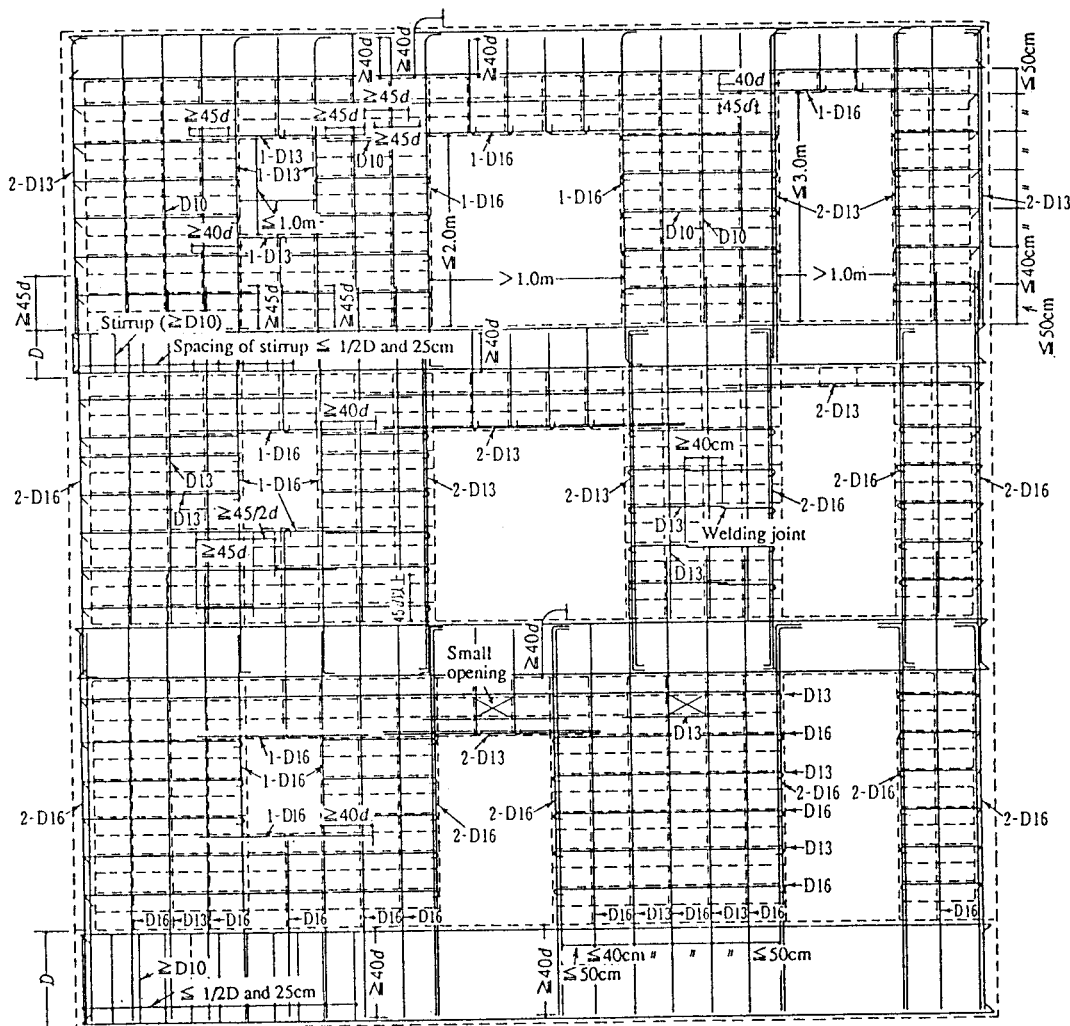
Example of standard reinforcement specified by the Architectural Institute of Japan *Standards for Structural Design of Masonry Structures* for a typical fully grouted masonry structure (from AIJ 1994).
